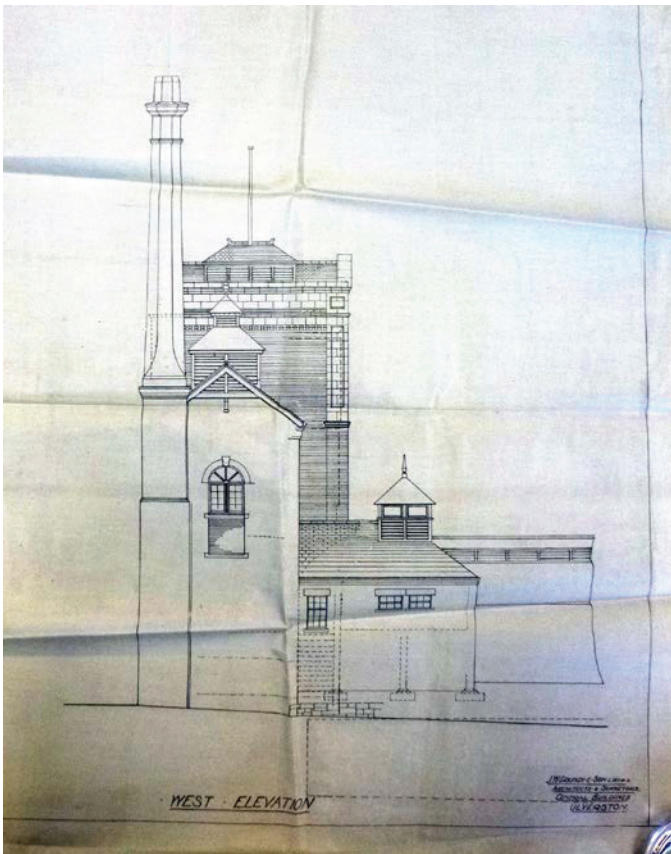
(left): Drawing number 7: west elevation; proposed additions to Old Brewery, 1919
